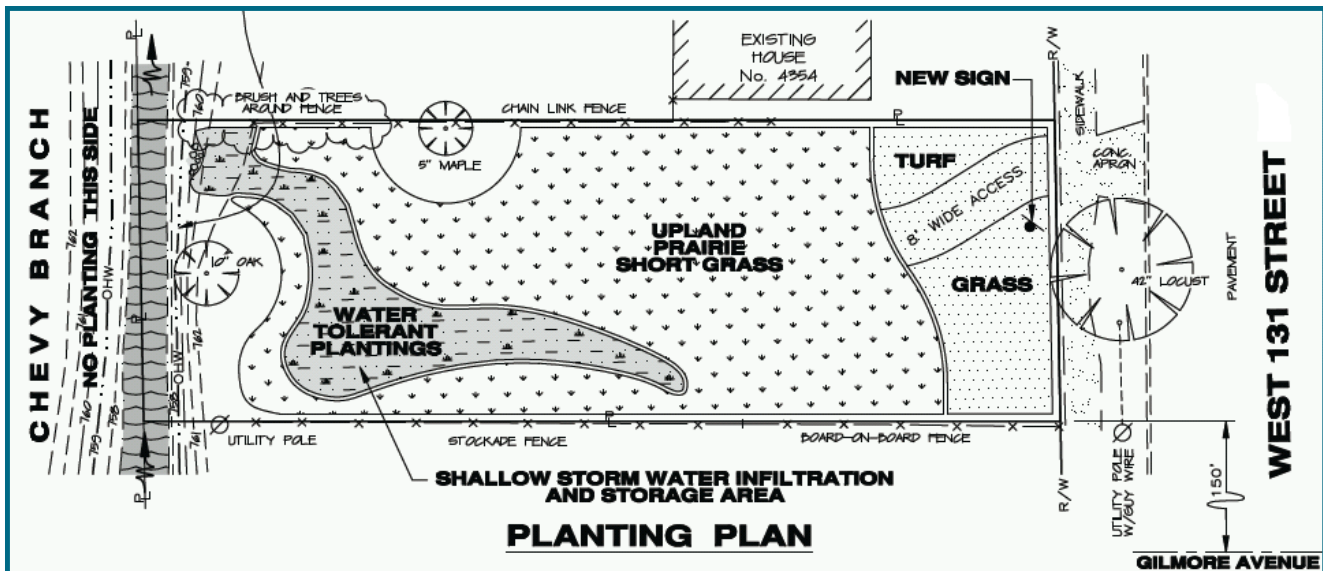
Planting plan for the case study site. Plan developed by Zwick Assoc., Inc., 2010.
